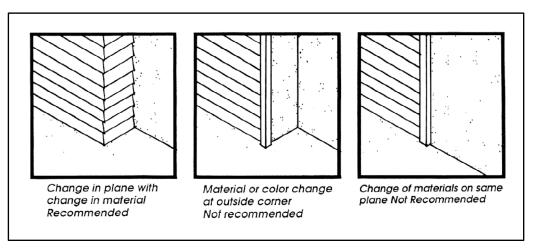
BUILDING MATERIALS AT WALL EDGES
